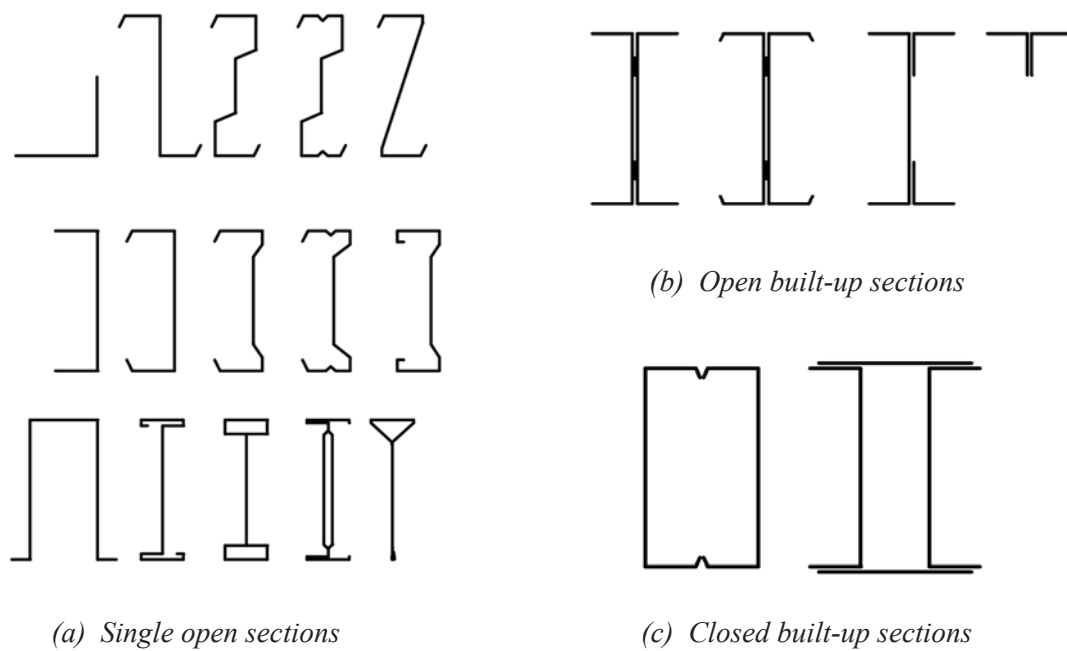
Typical forms of sections for cold-formed members [CEN (1996), EN 1993-1-3]
